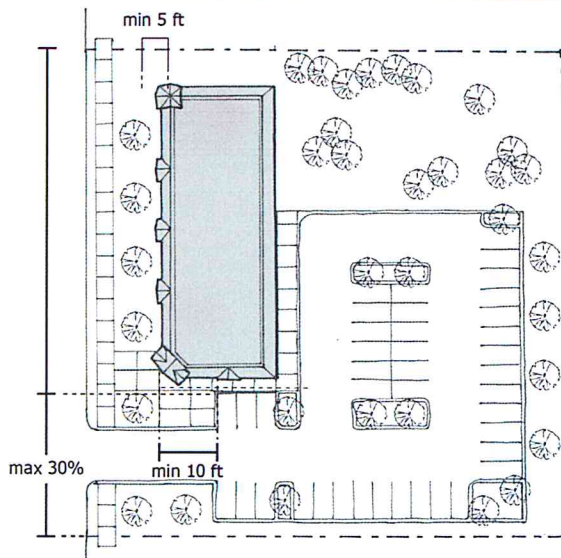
(Parking Lot Location): Side and rear yard parking provided in accordance with maximum 30% of frontage and minimum 10-foot front façade setback including landscaping requirements as required in Section 120-68.6.
